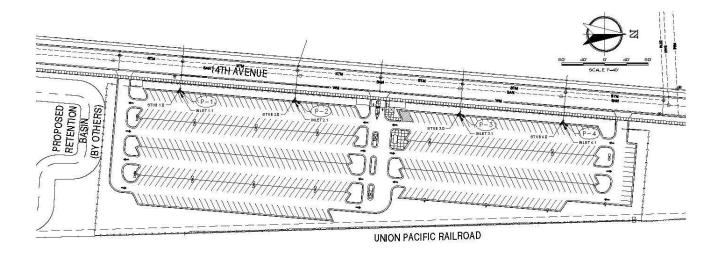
Carthage College remote parking lot plan - (Partners in Design)
